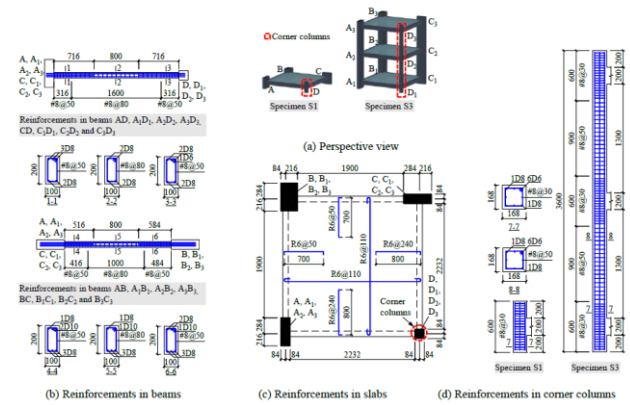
Reinforcement configuration and cross-sectional dimensions of test specimens S1 and S3 (dimensions in mm).
